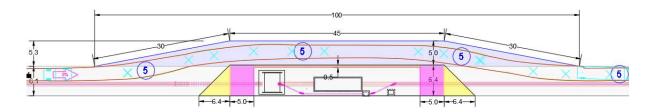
Site Layout – Side-loader trailer (Installation)
